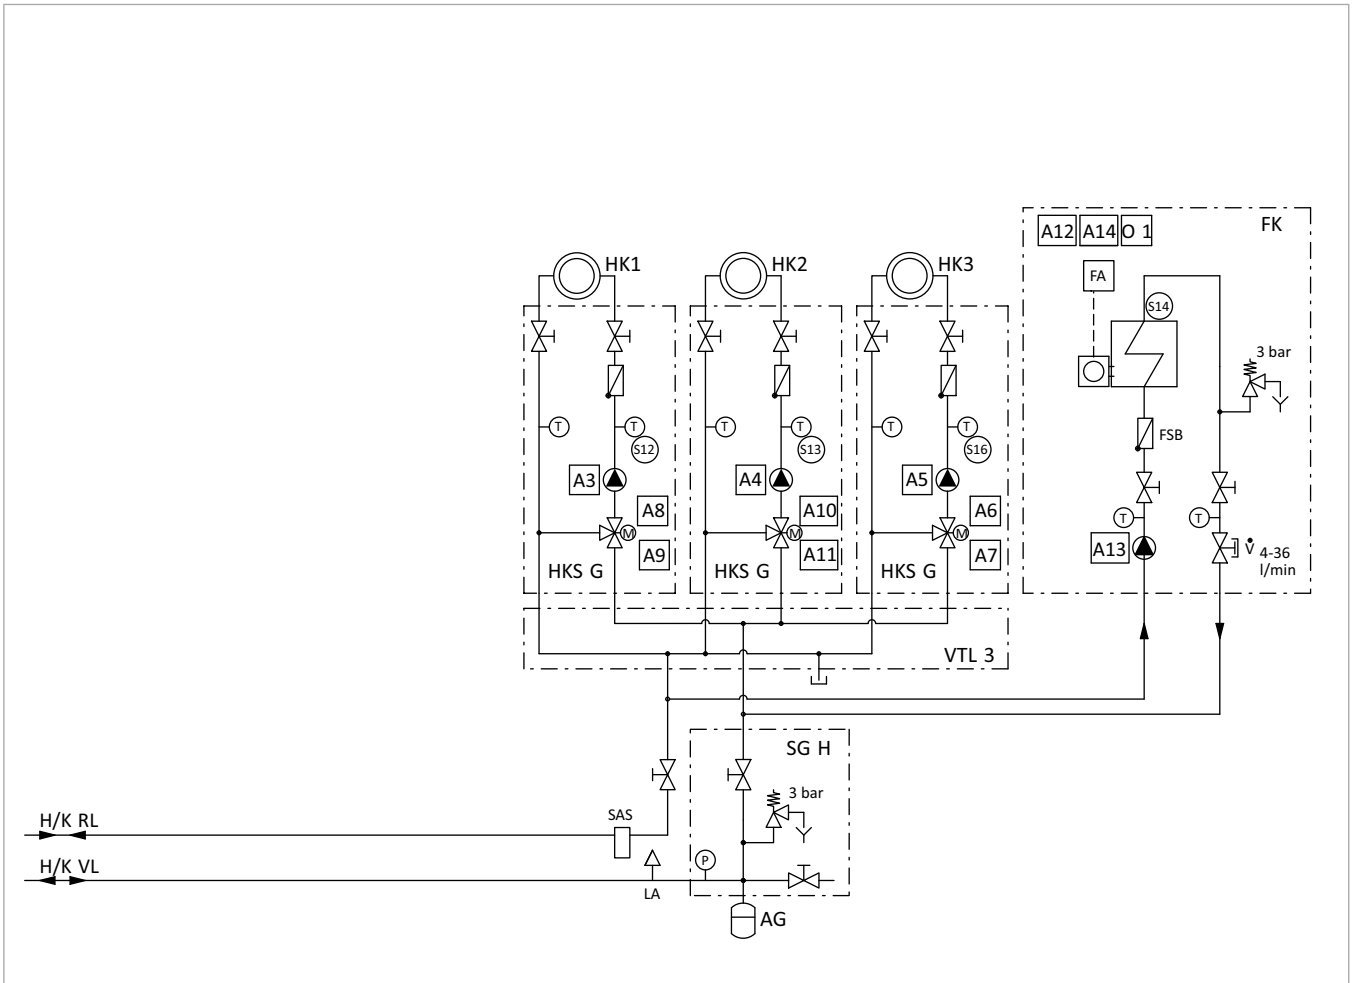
SolvisMax Solo basic version with third-party boiler and three mixed heating circuits – Part 2
